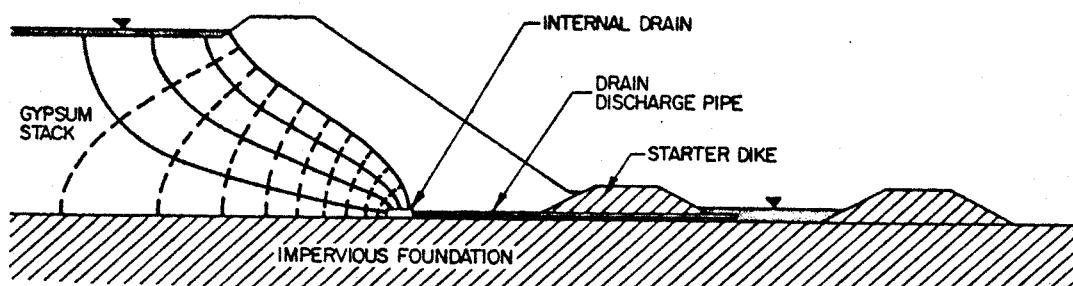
Seepage Pattern through a Gypsum Stack on an Impervious Foundation
